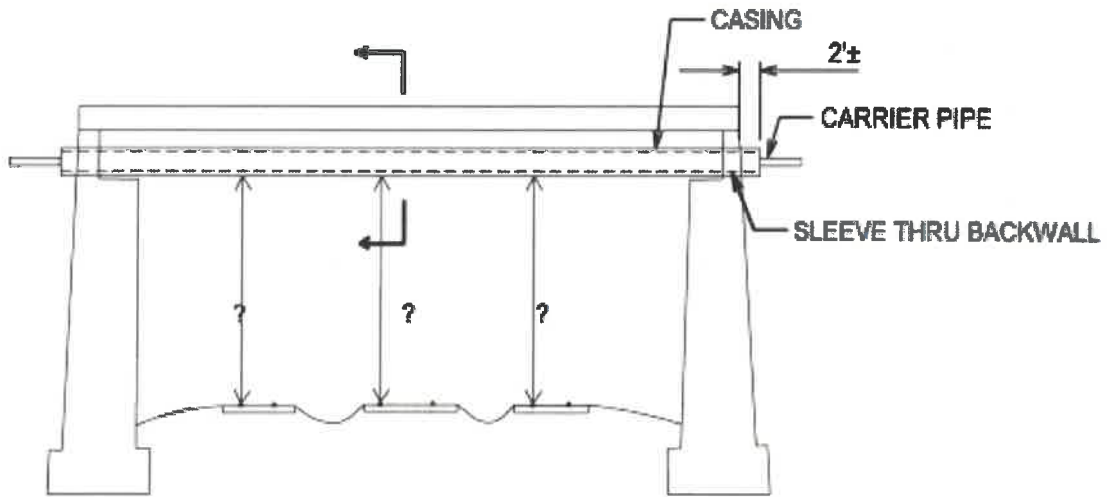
# Plate VI - Sample Pipe Plan and Section Under Railway Bridge
